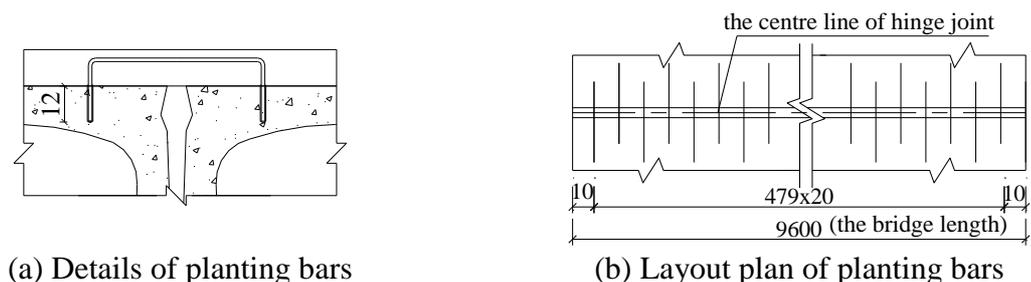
Schematic diagram of connection between the cast-in-place deck pavement and the original structure (unit: cm)
